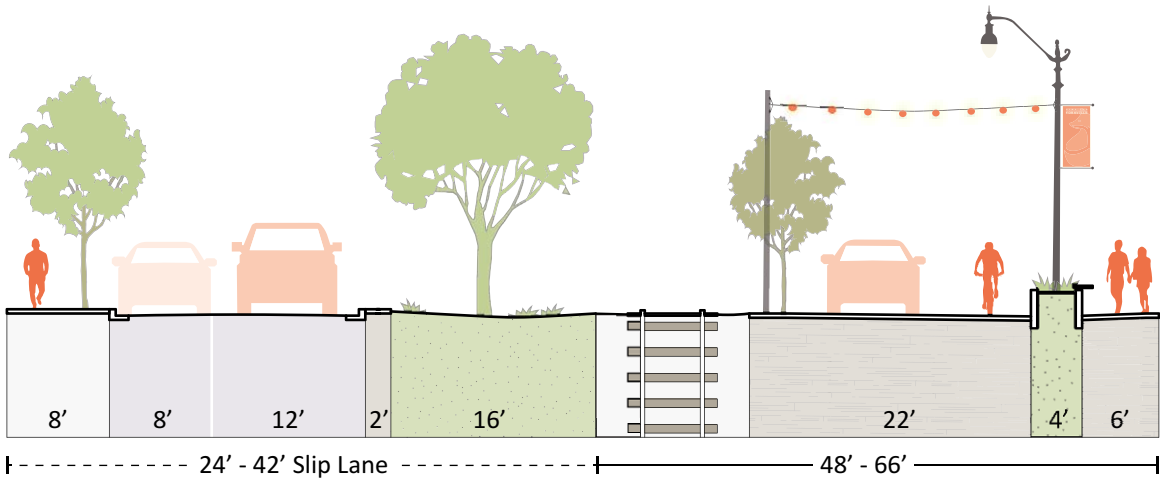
B (1). Hydraulic Street (Long-term).
